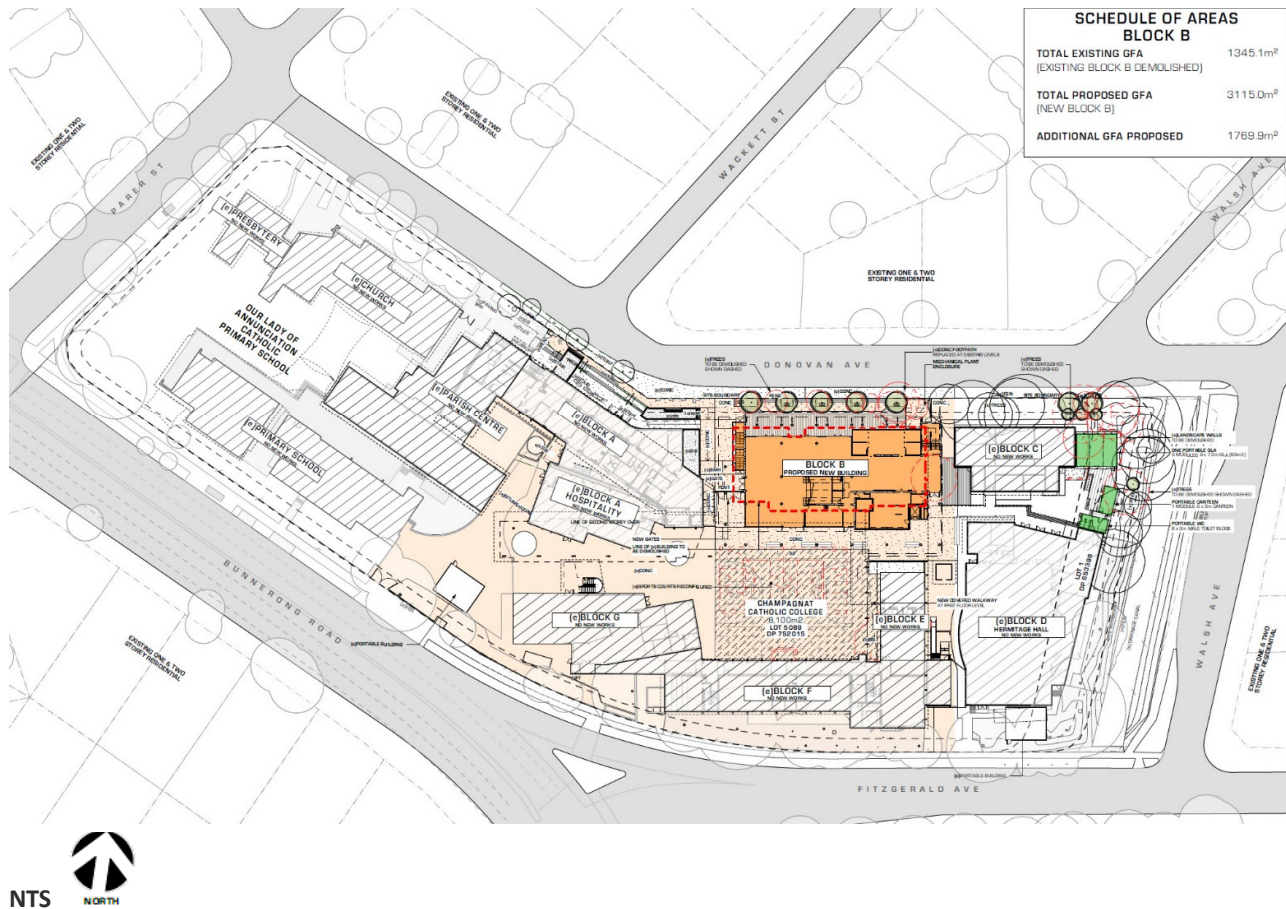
Proposed site plan (Source: QOH Architects, DA1100)
